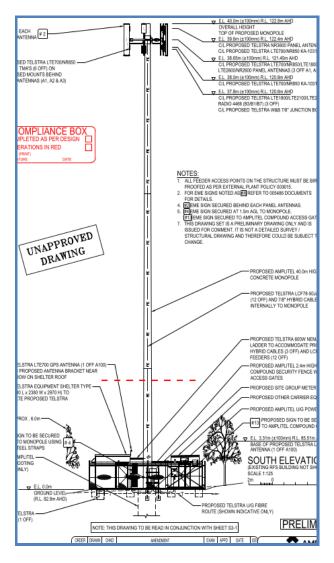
Extract of the elevations from the proposed plans. The dashed red line shows the 9.5 metre height of building limit.
